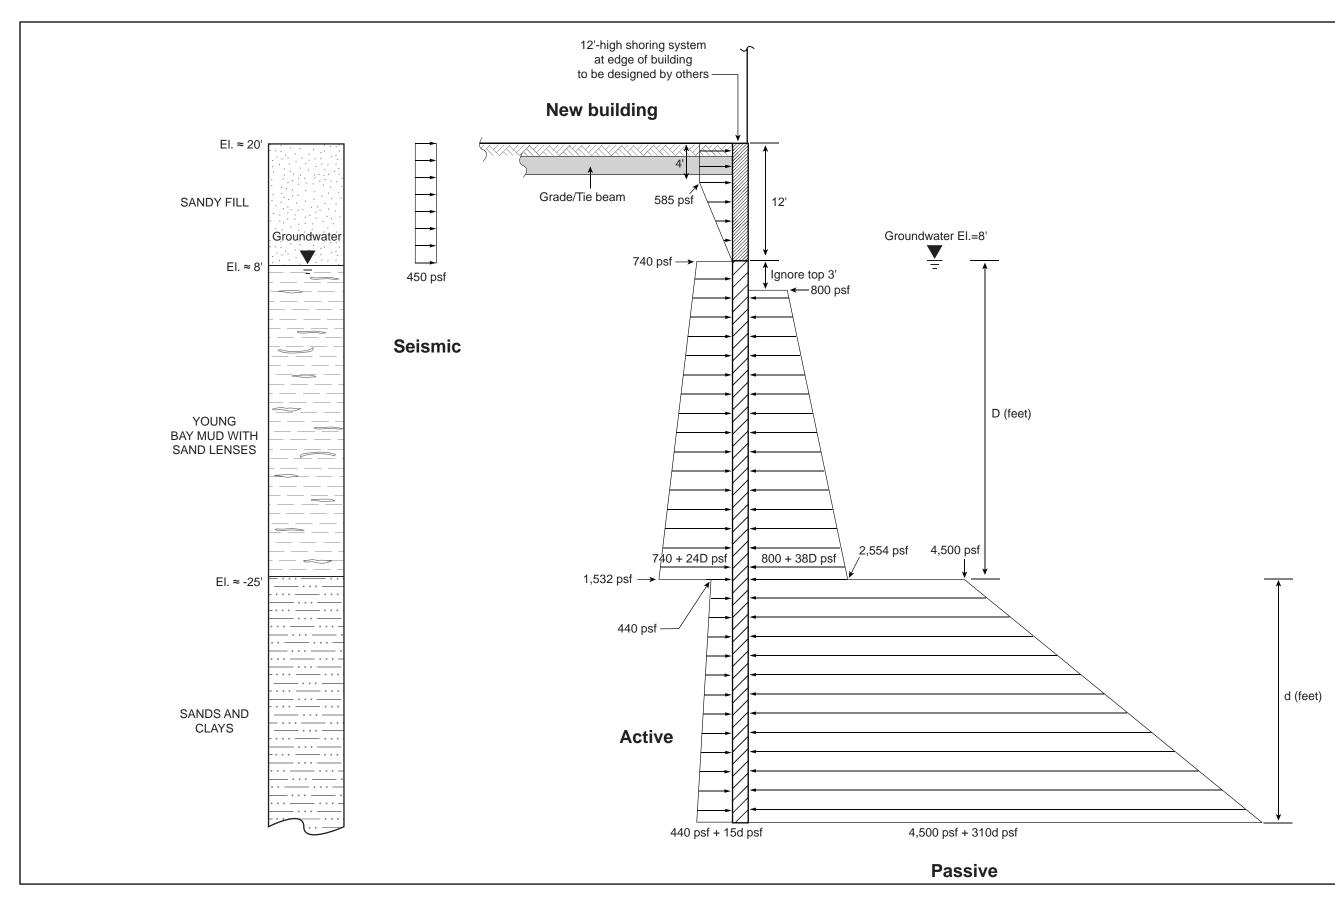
Recommended Lateral Pressures for 12-foot High Shoring System
